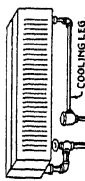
HORIZONTAL SECTIONAL FIN-TYPE HEATING UNIT
